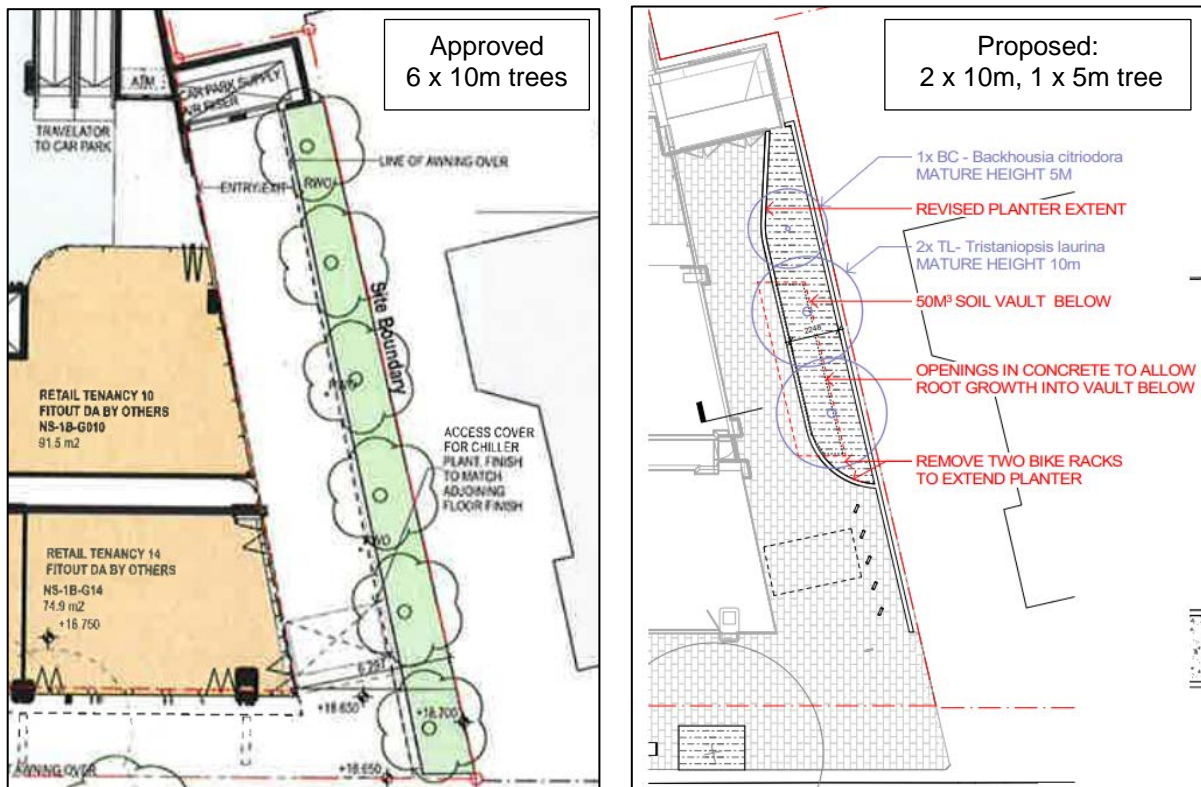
| Ground floor / landscape arrangements adjacent to North Site eastern retail entry, showing approved (left) and proposed (right) (Source: MOD 1 approved Plans and Proponents SRtS)
